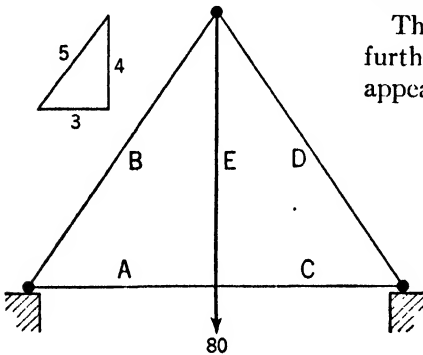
A "KING-POST" TRUSS WITH LOAD AT CENTER
